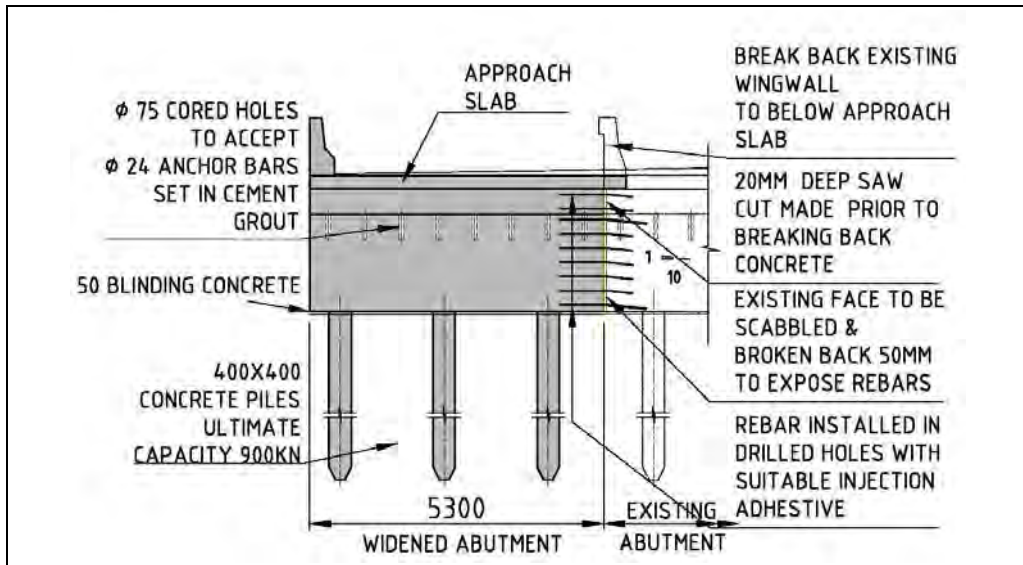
Abutment Widening Connection Detail for Full 4-Lane
